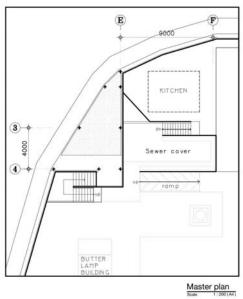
,23. Design development and construction plan of new disabled restrooms in Memorial Chorten.
